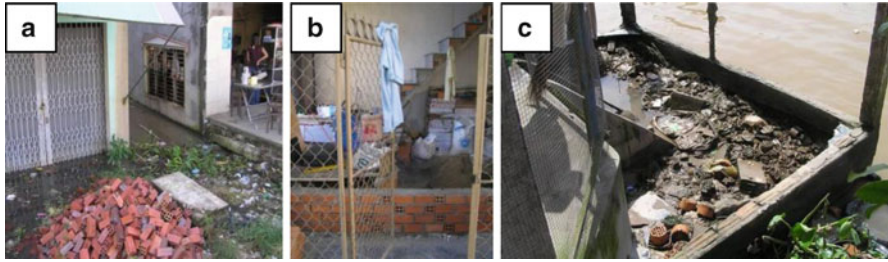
(a) Floor elevation, (b) floor elevation, and (c) river bank erosion protection and floor elevation (Source: own pictures Garschagen 2009)
